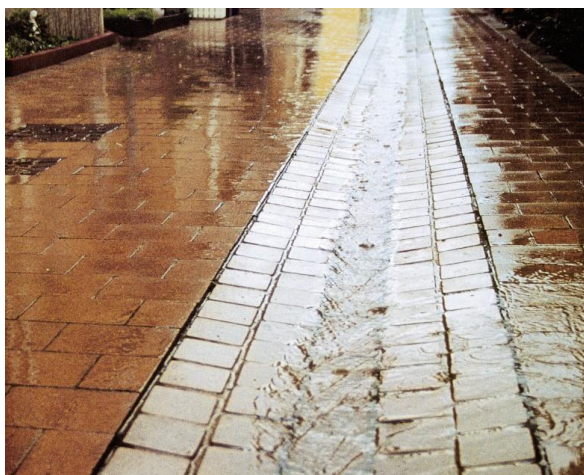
Hollow Road (source: Atelier Dreiseitl)
